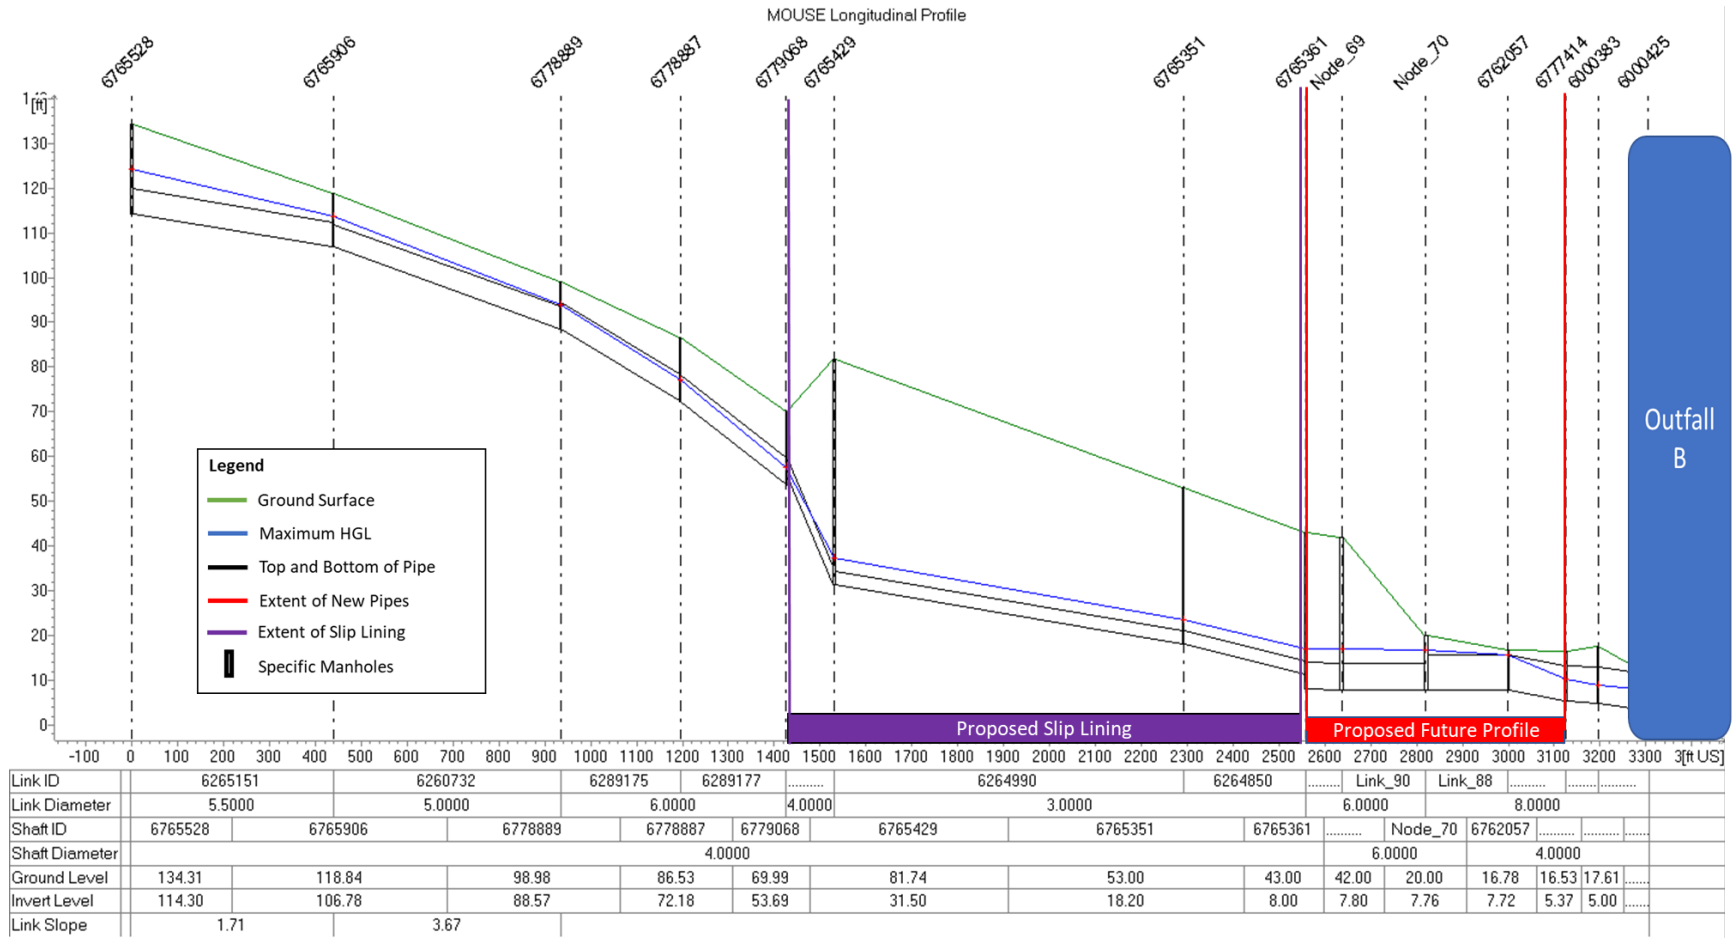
Finalized Stormwater Profile to Outfall B throughout D-M Project Area
